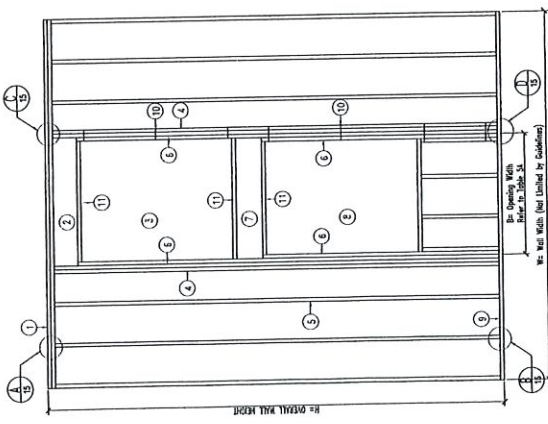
Figure X-FULL HEIGHT STUDS WALL FRAMING
